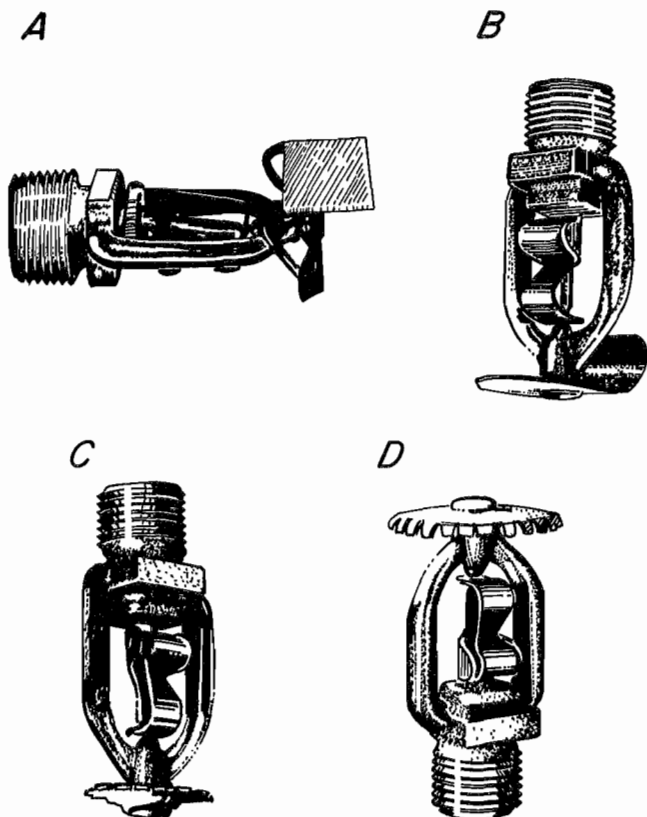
Sprinkler heads. A, Horizontal sidewall; B, pendent sidewall; C, pendent; and D, upright sprinkler heads.
